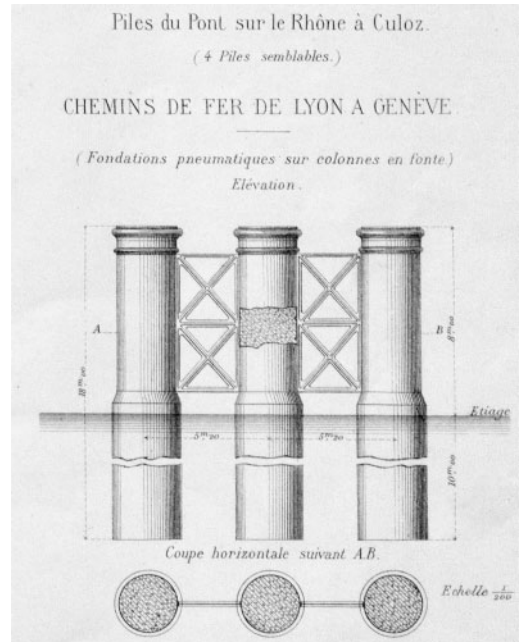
Culoz Bridge: the geometry and connections of the cast iron cylinders (Goüin 1878).
